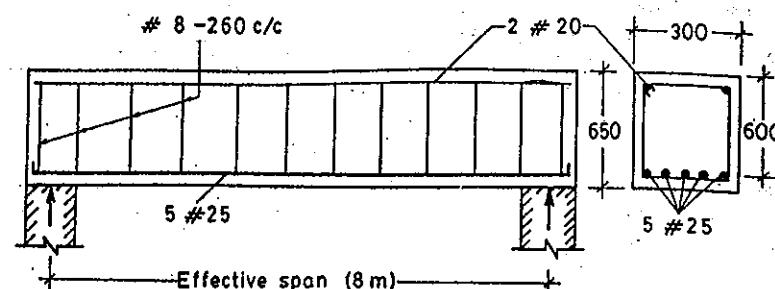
Reinforcement Details in Doubly Reinforced Beam
